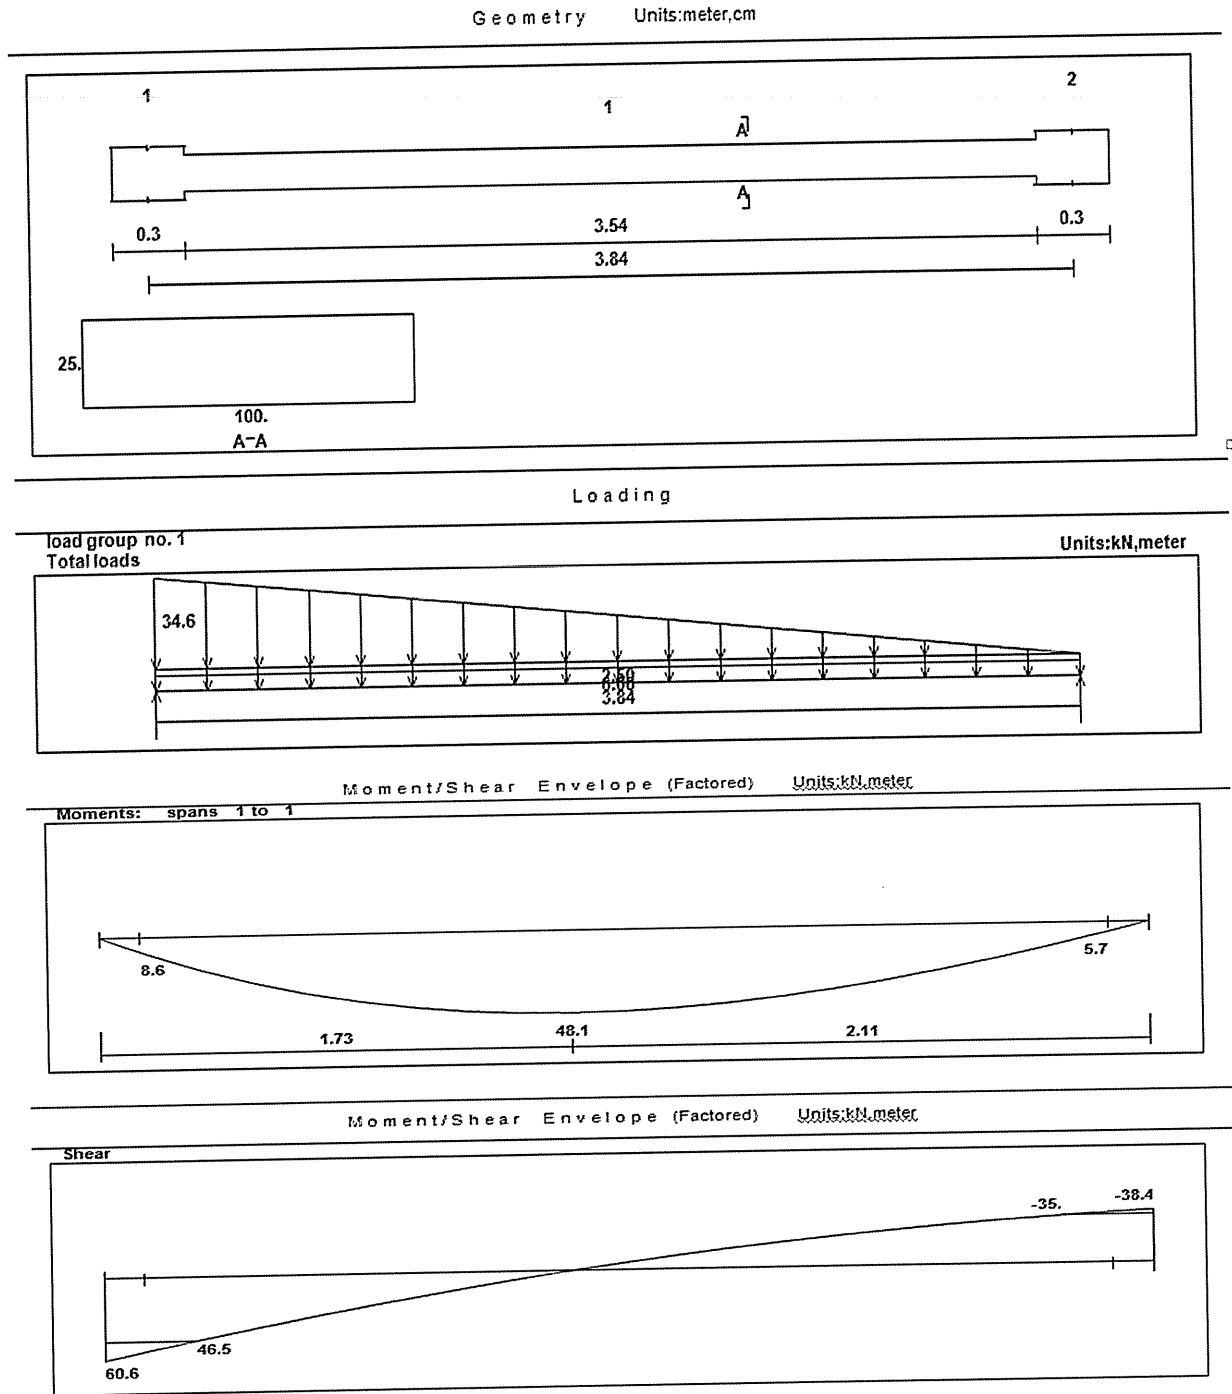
Loading and Envelope of Basement Wall ( BW1 )
